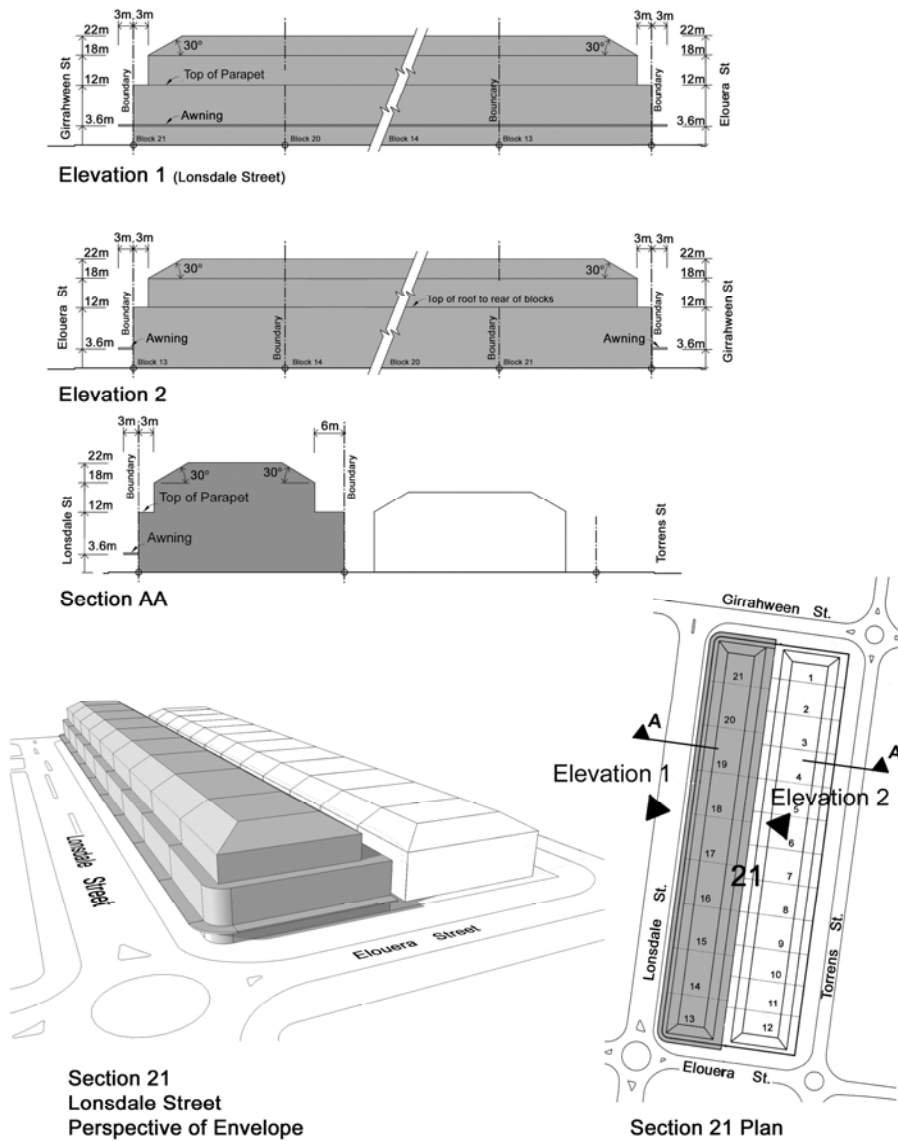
Building Envelope Diagram - Braddon section 21 blocks 13 – 21
